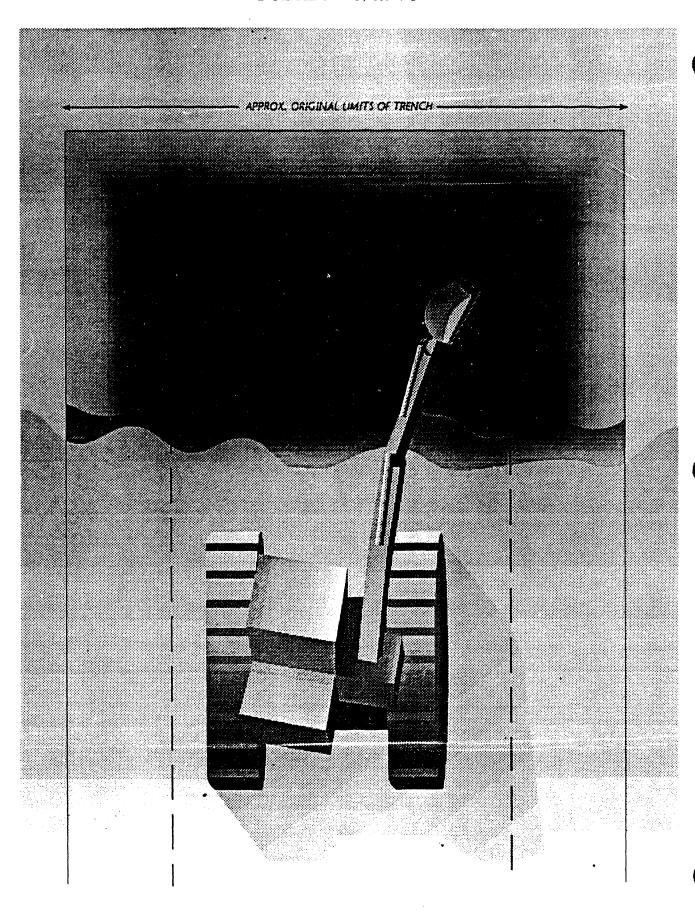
TOP - DOWN EXCAVATION APPROACH - OVER TRENCH
